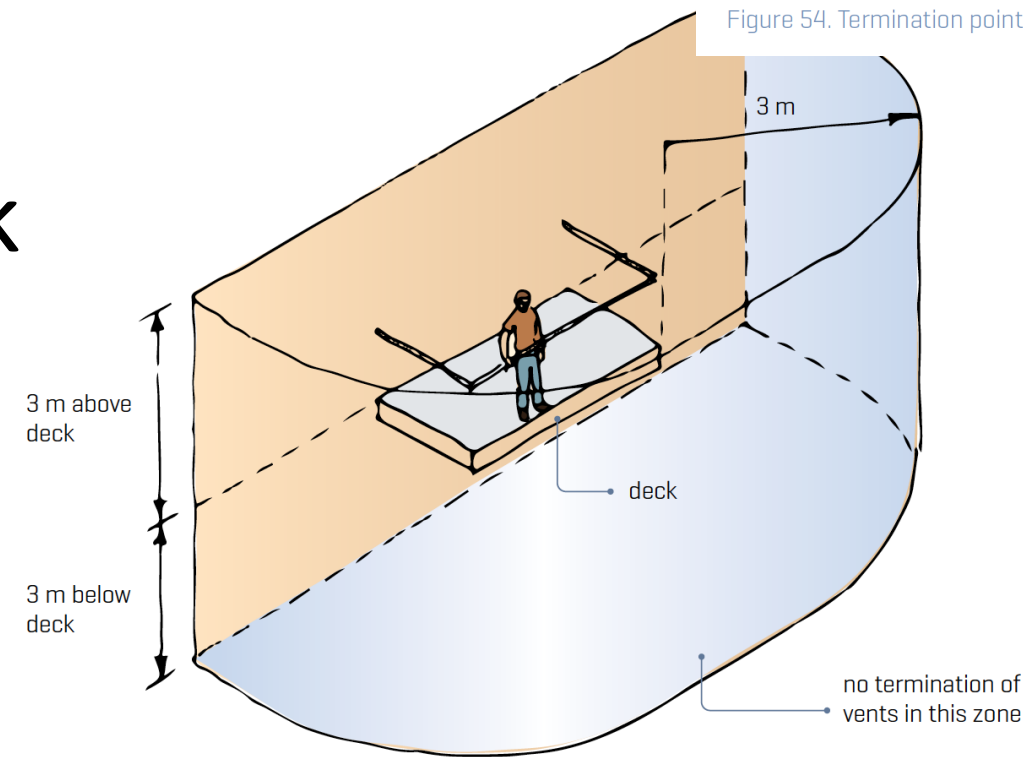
Termination point of vent 3 m above and 3 m horizontally from a deck.
